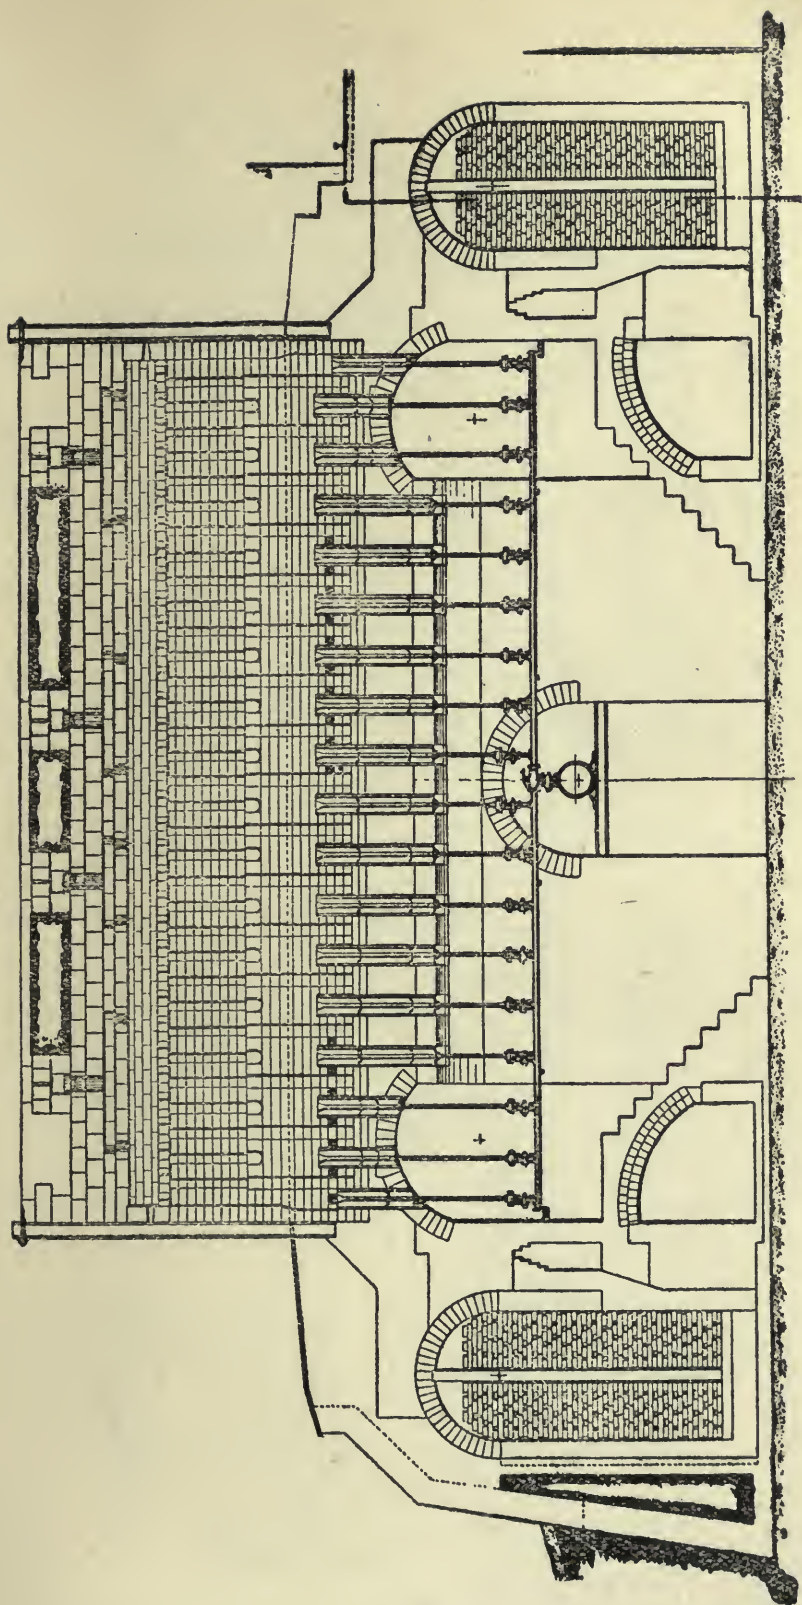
Section through Wall of Otto Regenerative Oven.
